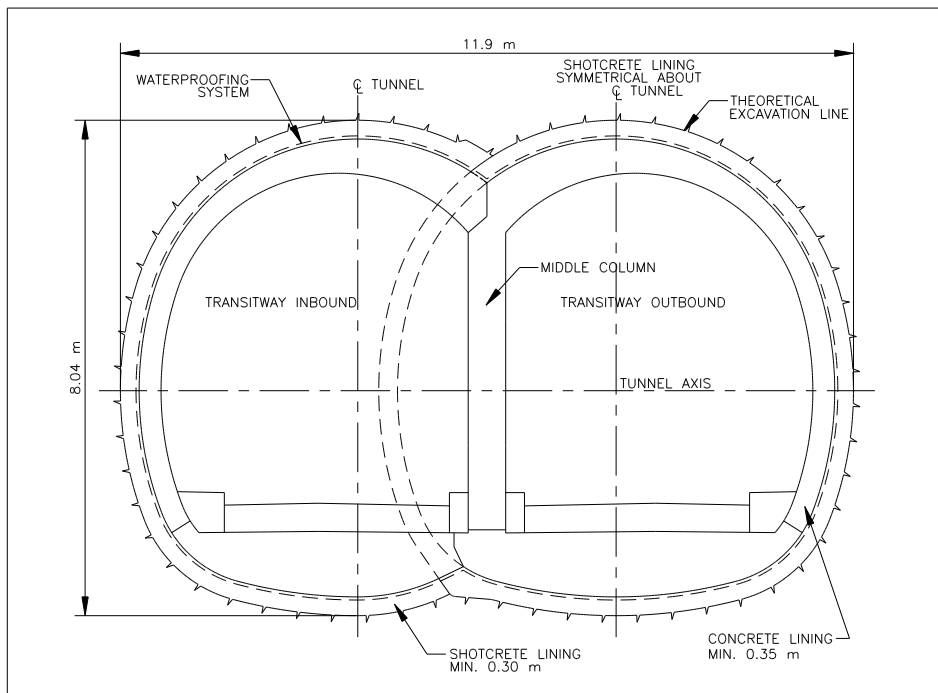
Typical Dual Lining Tunnel Cross Section
